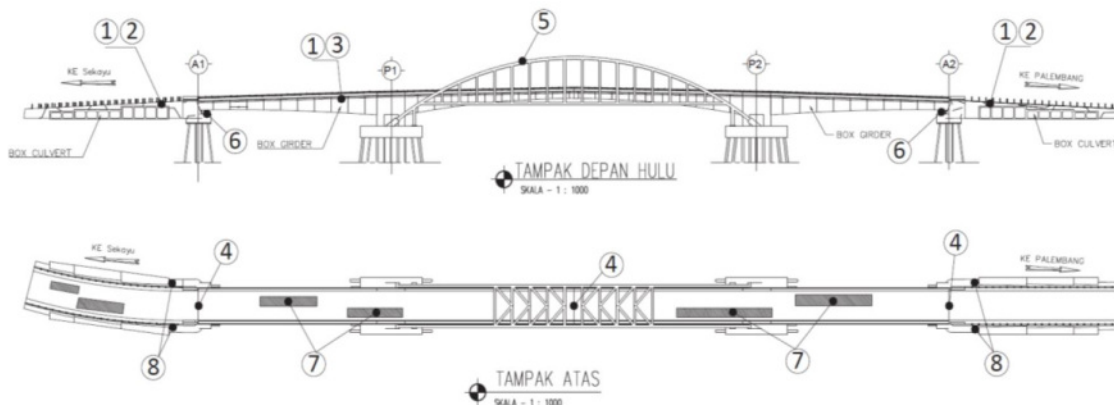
Longitudinal and Plan View of Teluk Baru Bridge Rehabilitation Work
